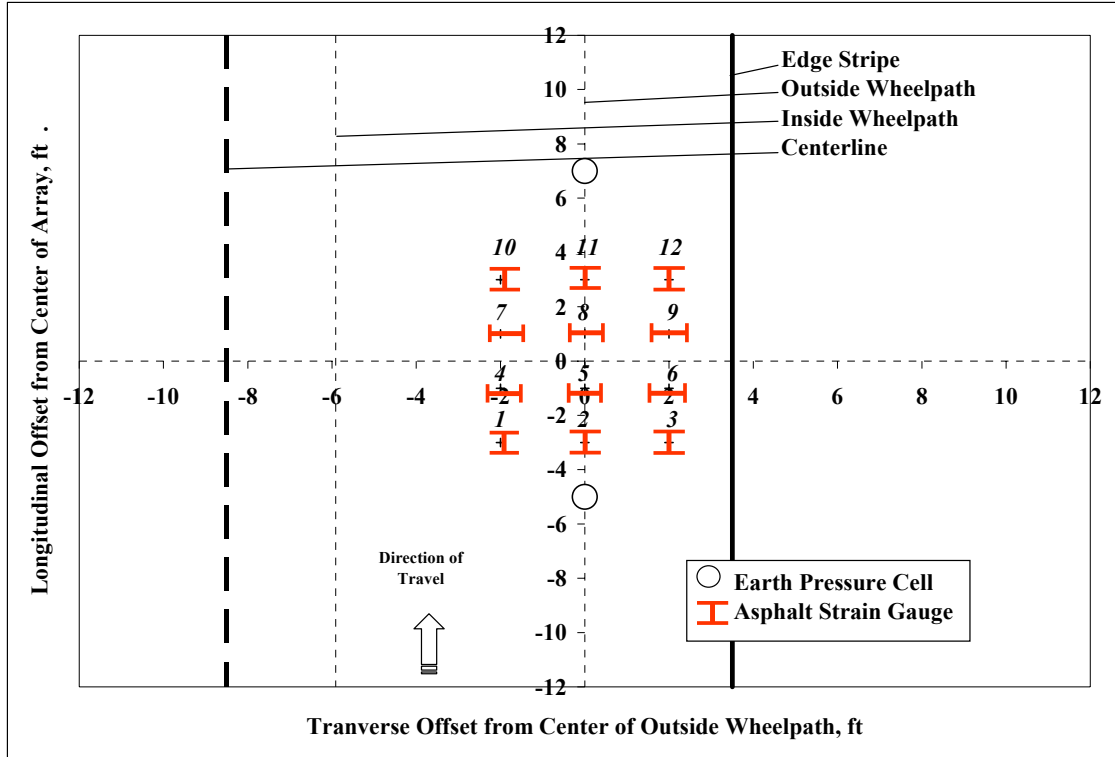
Layout of Gauge Array for a Typical Structural Section (after Willis and Timm 2008).
